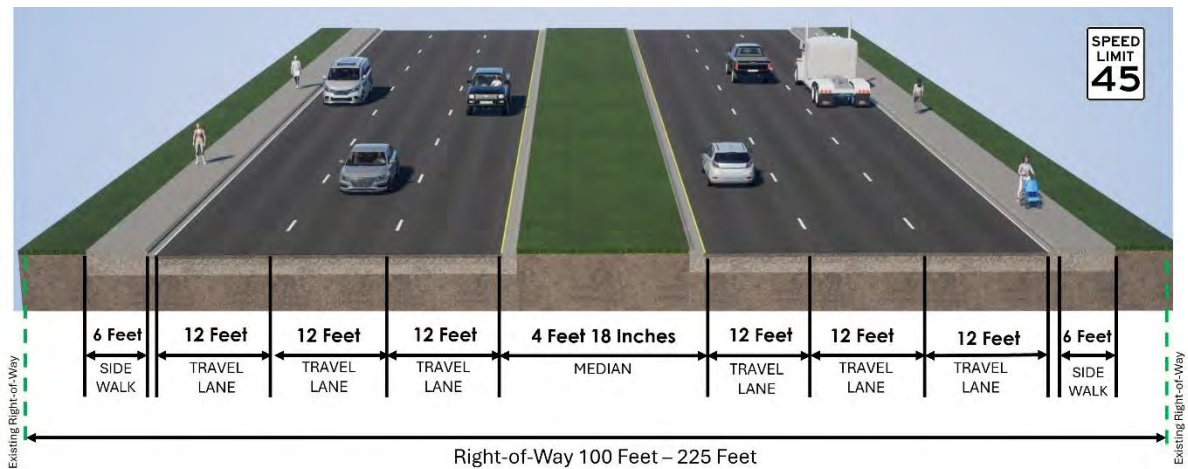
Existing Roadway Typical Section: South of DeSoto Bridge
